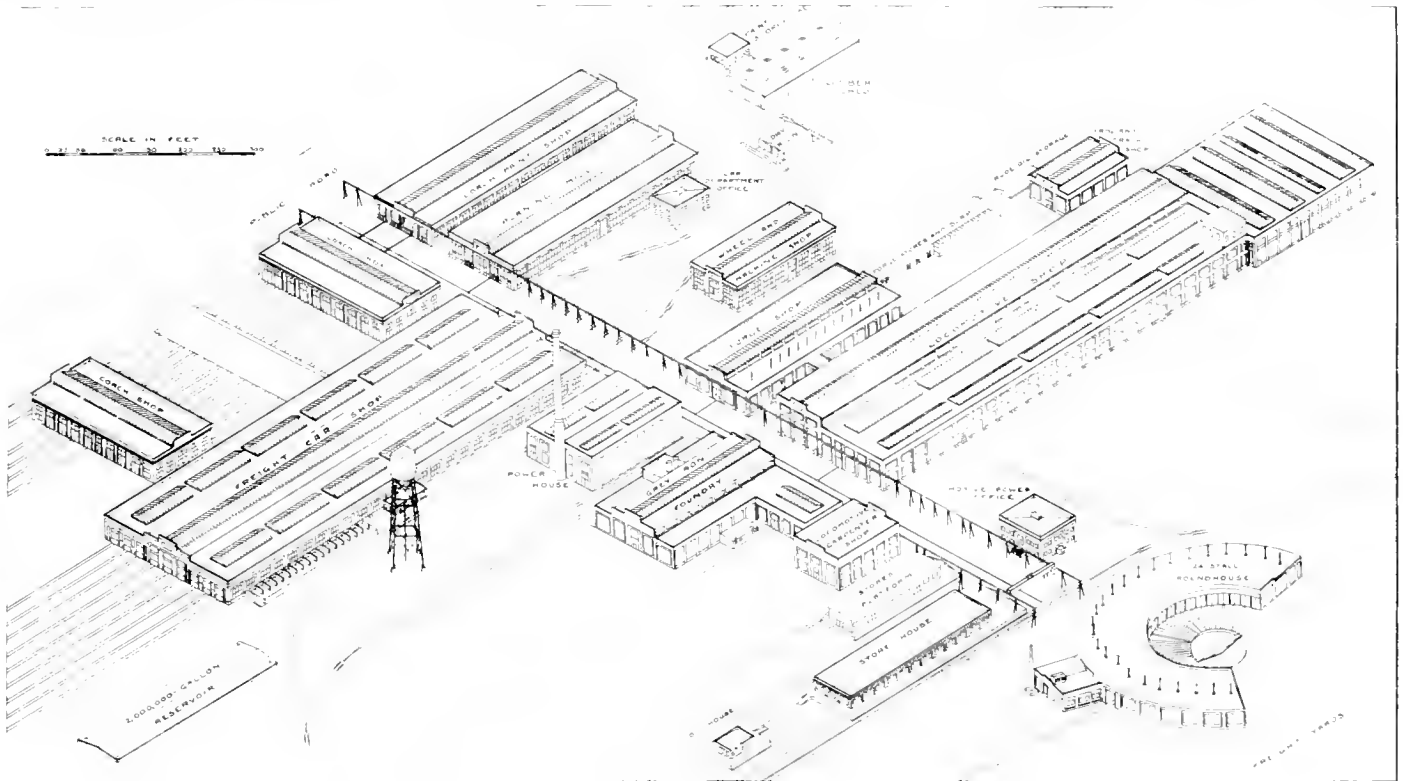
Isometric Projection of Locomotive and Car Department Buildings, National Transcontinental Railway
